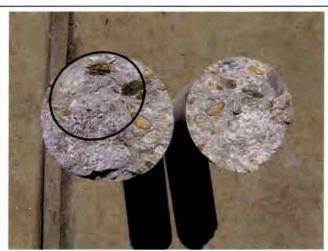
Core 1, Segments 10 and 11 – Silica gel forming in concrete.
